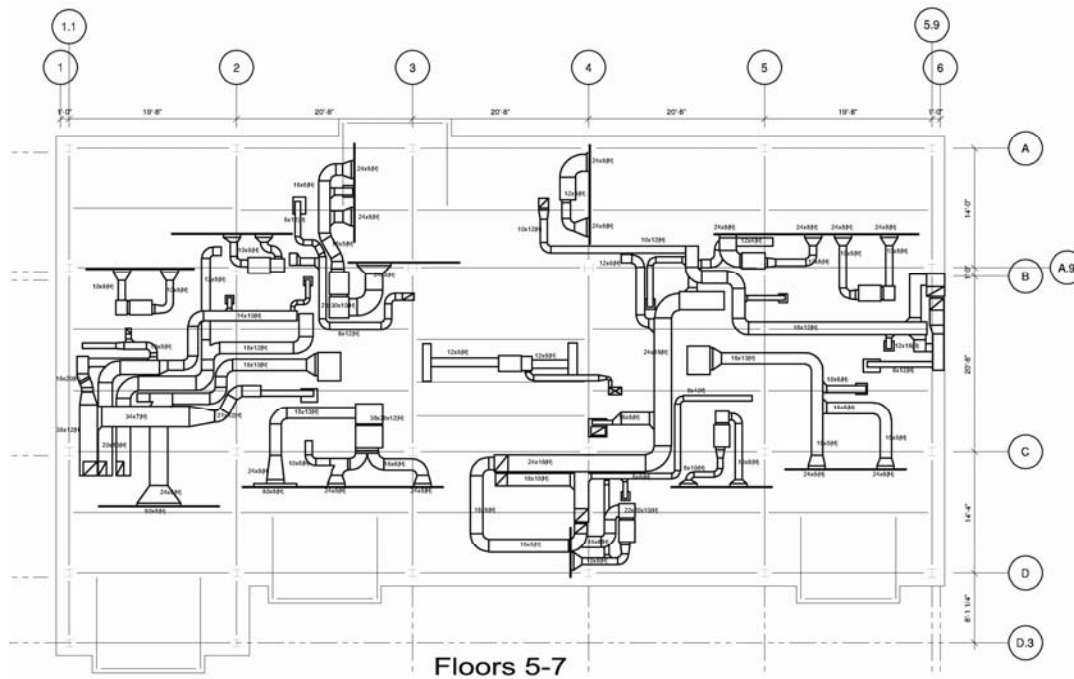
Typical floor section showing HVAC duct placement and ceiling heights
